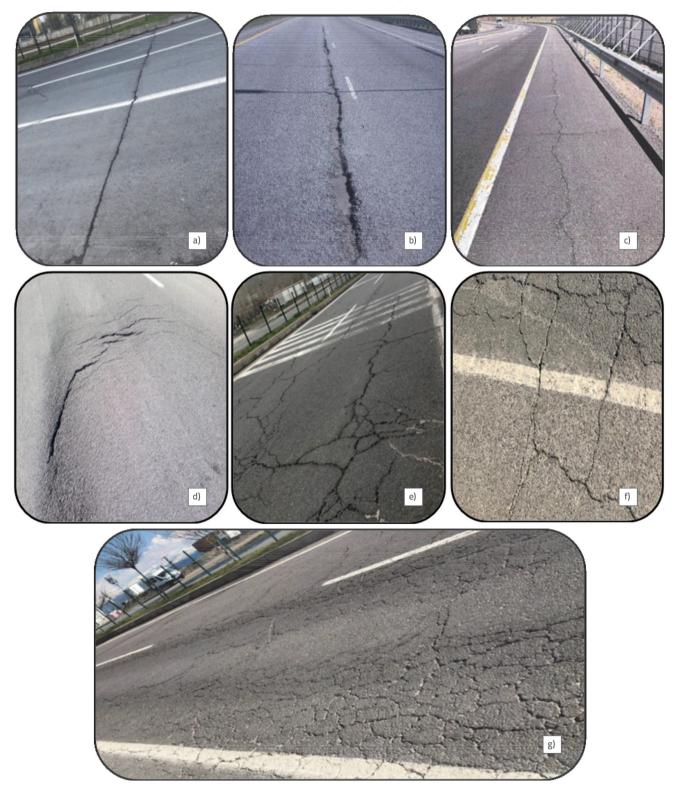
Asphalt cracks: a) Transverse cracking; b) Longitudinal cracking; c) Edge cracking; d) Slippage cracking; e) Reflection cracking; f) Block cracking; g) Fatigue cracking
